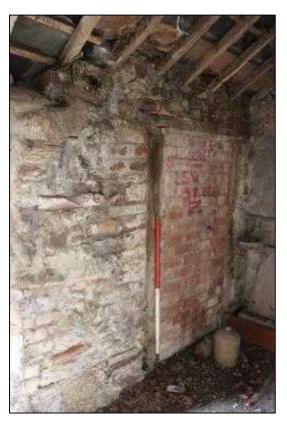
Link Building A/B, interior, west elevation (Feature 102)
